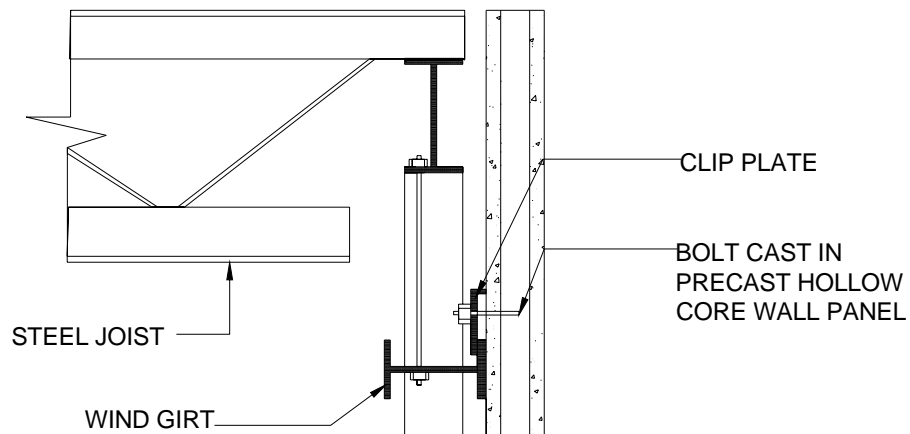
Steel frame structure sitting on non-load bearing precast hollow core wall (Precast Technology, 1991)
